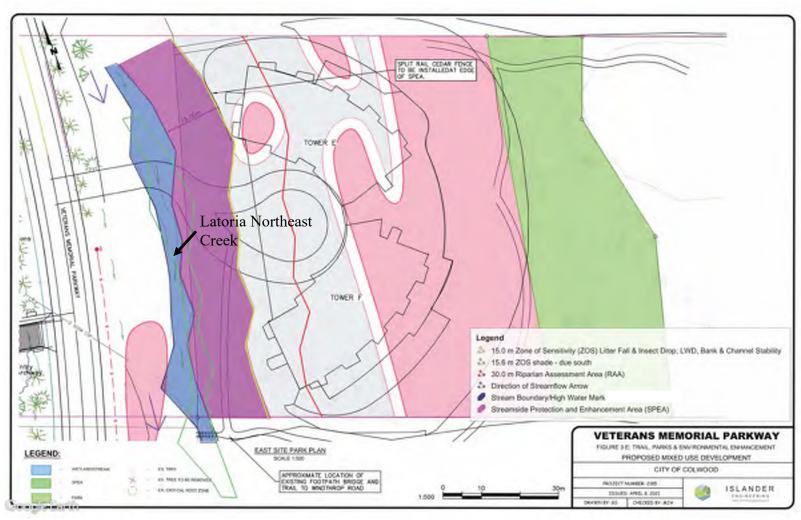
Site Plan for the east development showing the RAPR ZOSs, HWMs, property boundaries, and building footprint. Pink polygons on this site plan indicate steep slope areas.
